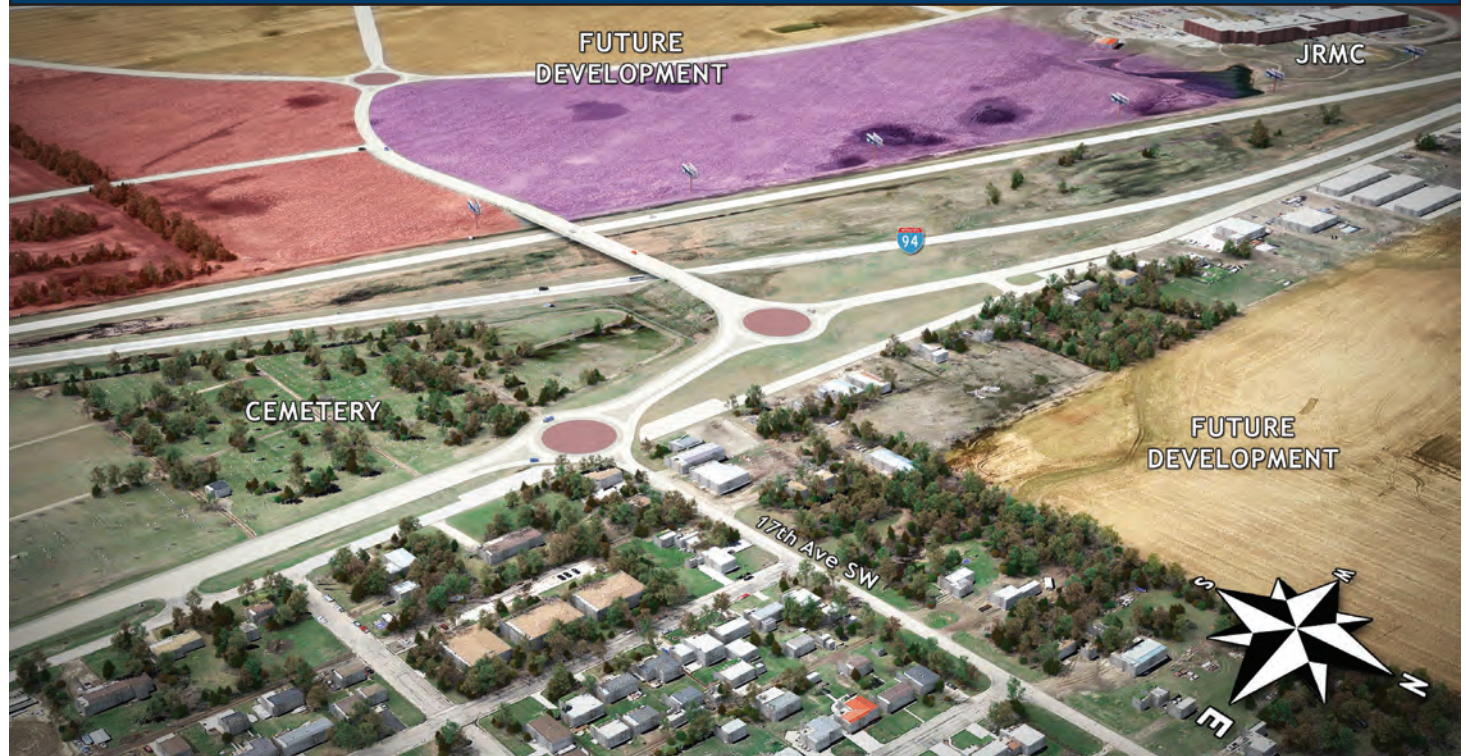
illustrates a concept for the 17th Avenue overpass and the connecting road system in the southwest sector. The concept
